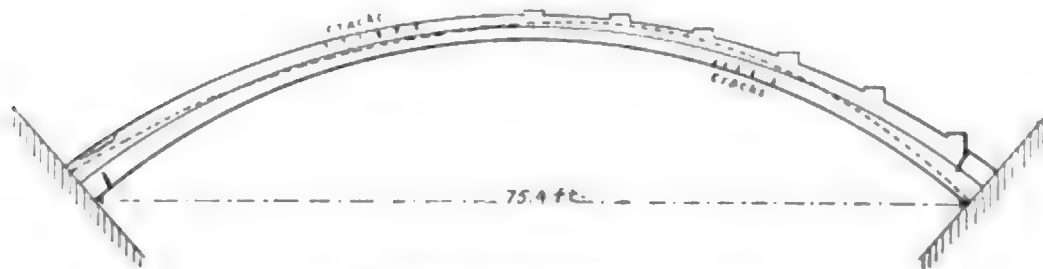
FAILURE OF MASONRY ARCH.
